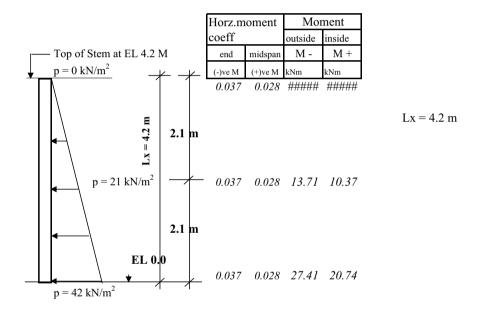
Lateral forces and moments in the horizontal plane
